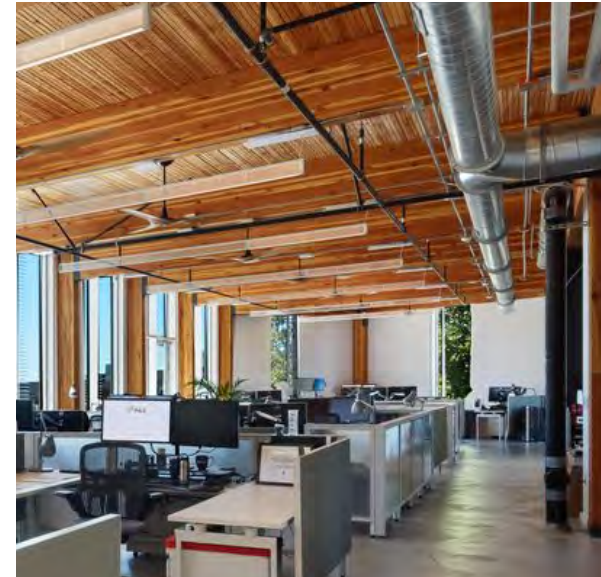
| HVAC and MEP on Timber Ceiling.
